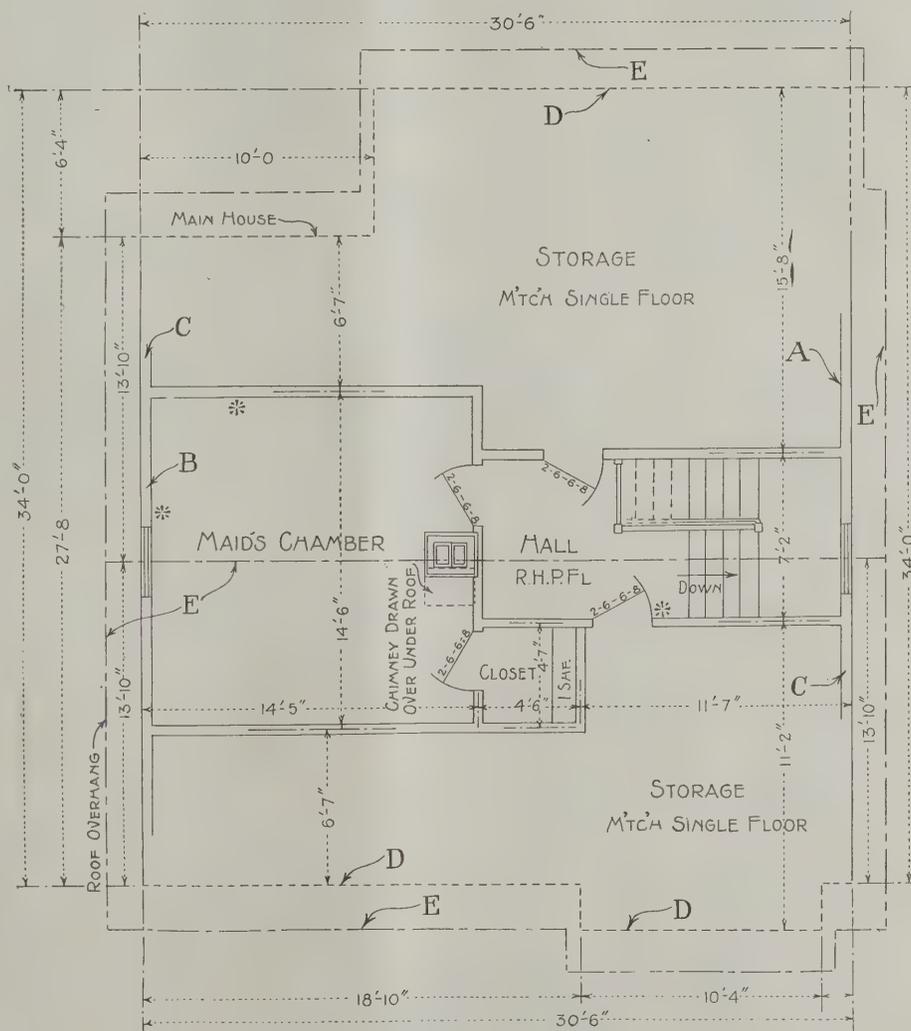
Attic Plan—Scale $\frac{1}{8}$ -In. to the Foot
